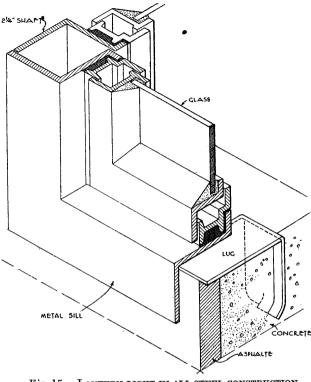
LANTERN LIGHT IN ALL-STEEL CONSTRUCTION
